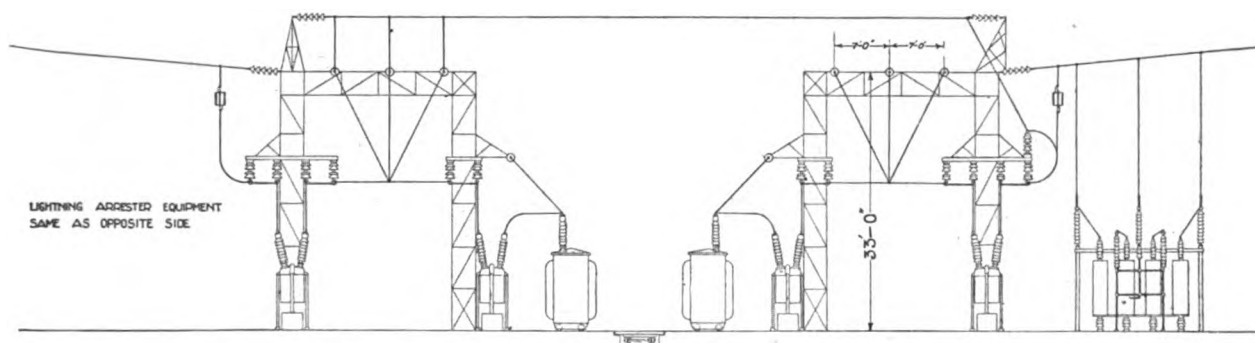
Layout of 88-kV outdoor station. Sectional elevation.
